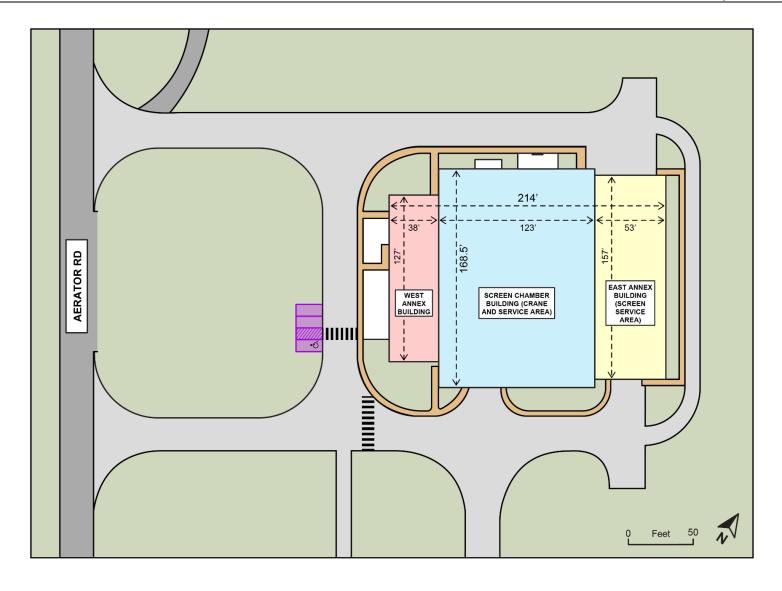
KEC Screen Chamber Site Plan and Building Layout
